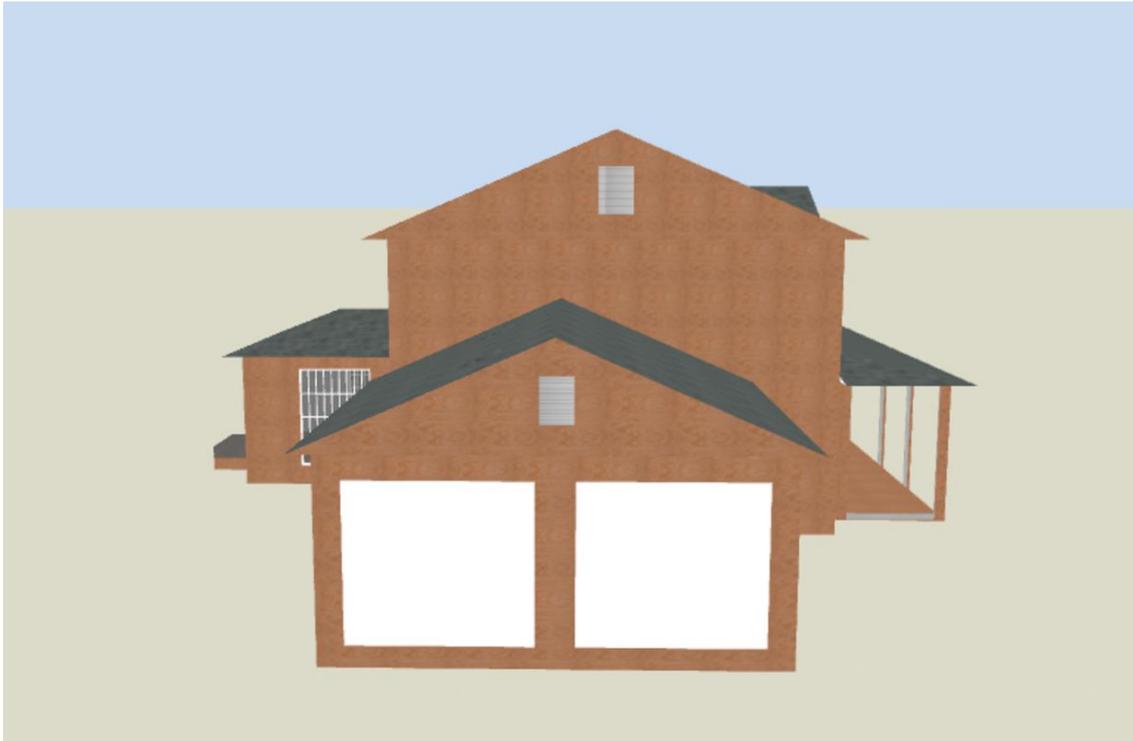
Rendering - Left elevation view of MH.
